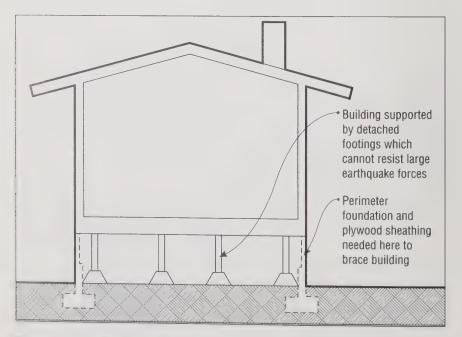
Houses with unbraced pier footings are vulnerable to earthquake forces.
